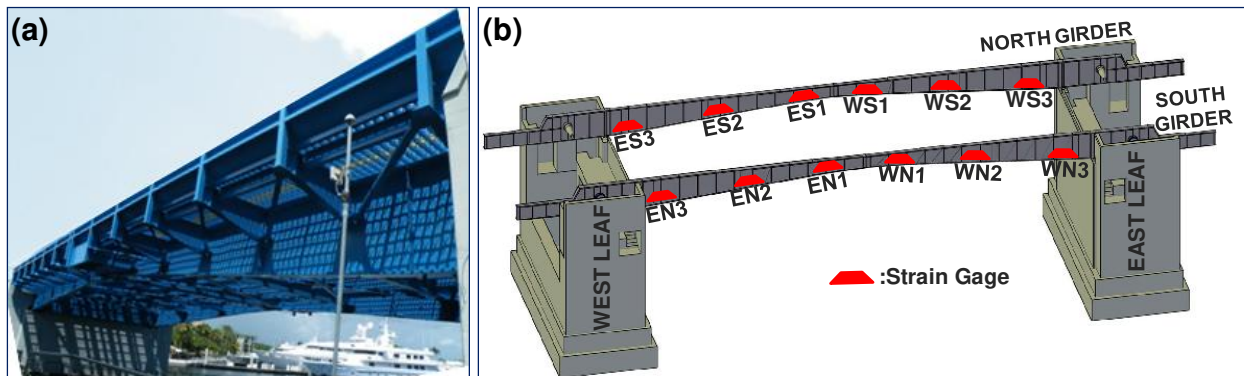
Sunrise Boulevard Bridge (a), strain gage locations and nomenclature (b)
